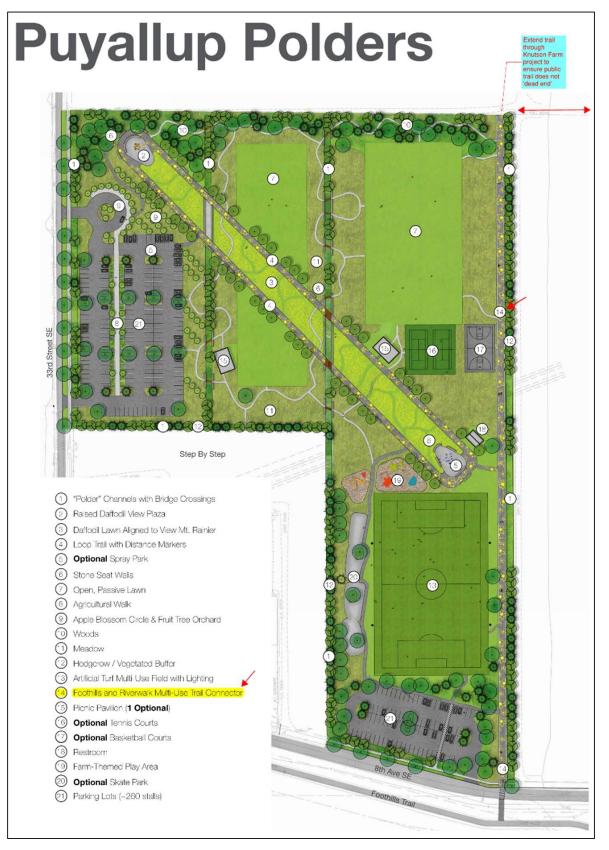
Excerpt from City's PROS Plan Showing Van Lierop Park Layout
